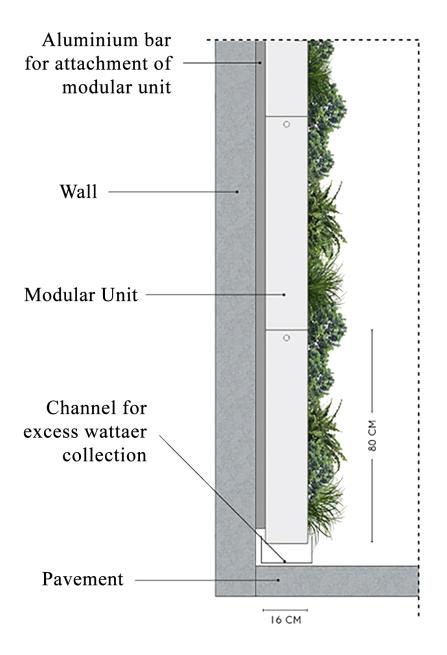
Modular living wall system elevation on wall section (*Preserved Greenery Como*, n.d.)
